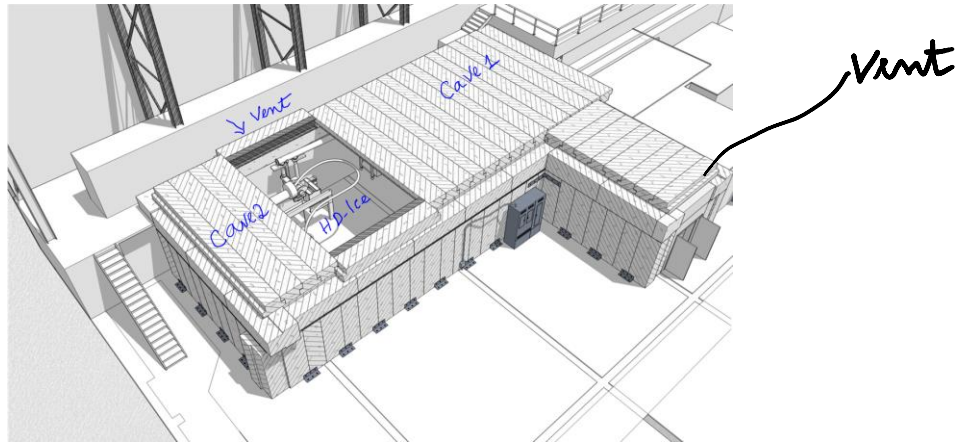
&2: UITF with Ceiling in place and without ceiling on Cave 2
